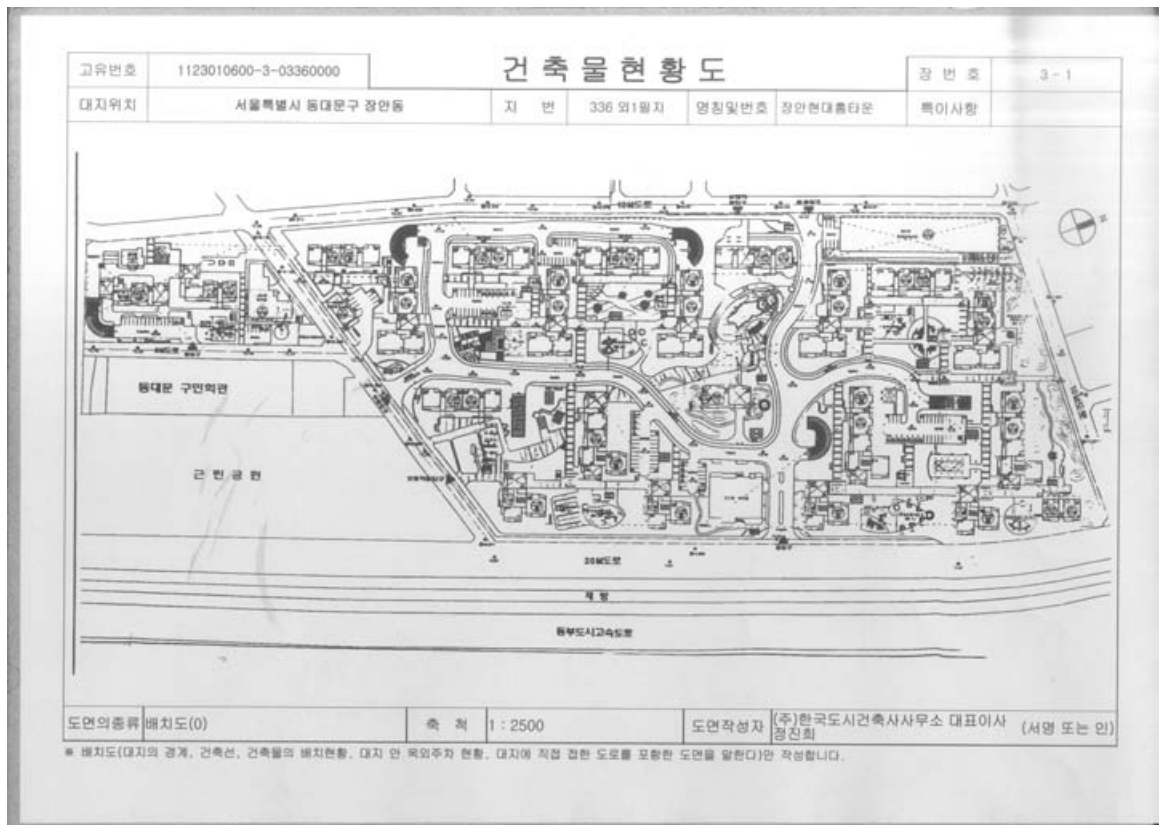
Site plan of Jangan H apartment estate – 2 (Dongdaemun Gucheon)
